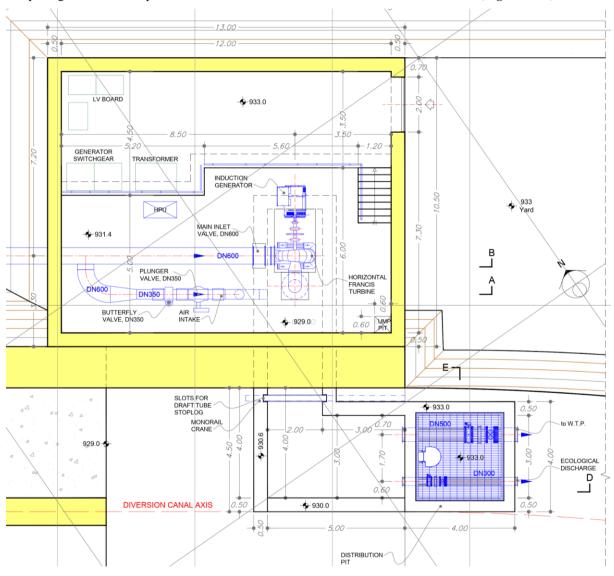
Powerhouse - Horizontal Cross-section (Studio Pietrangeli, 2019)
